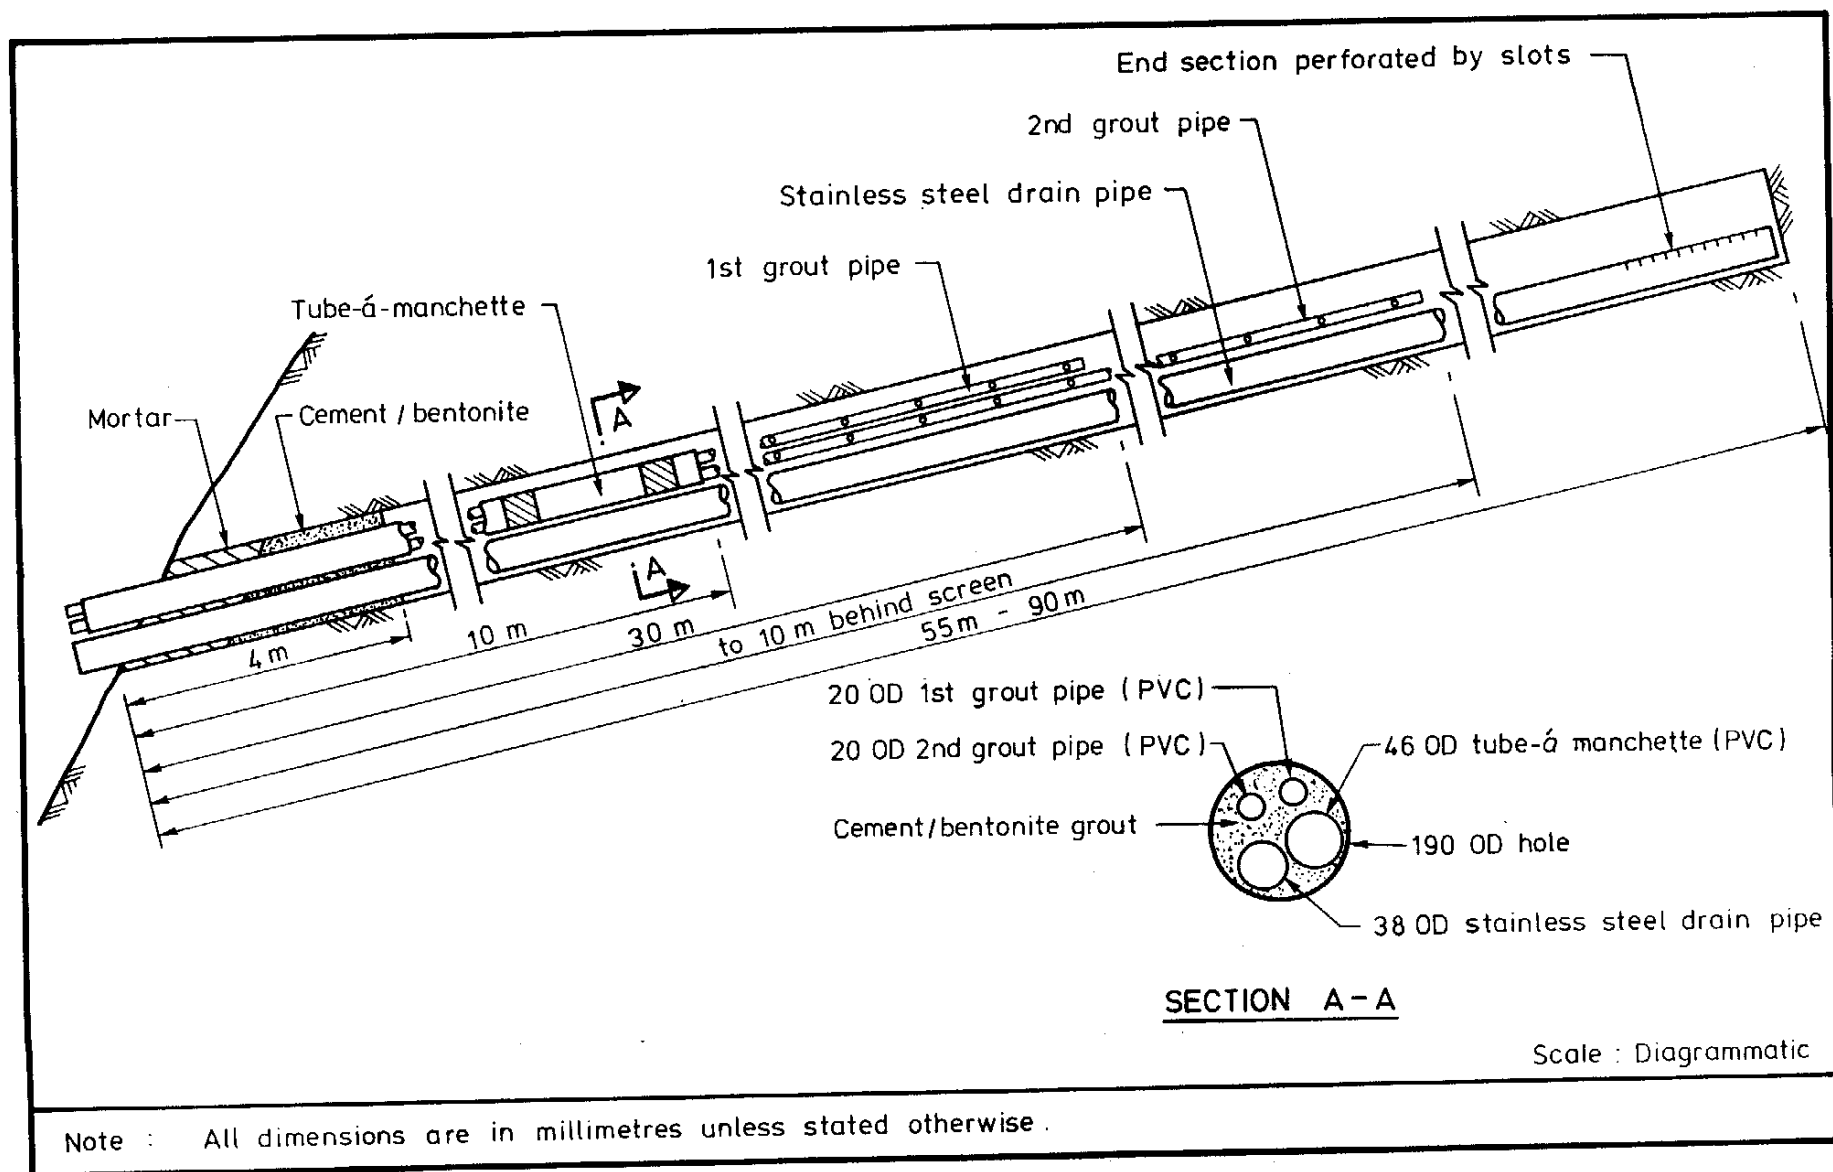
Grouting System for Drains Installed in the Retaining Wall Behind Po Shan Mansion
